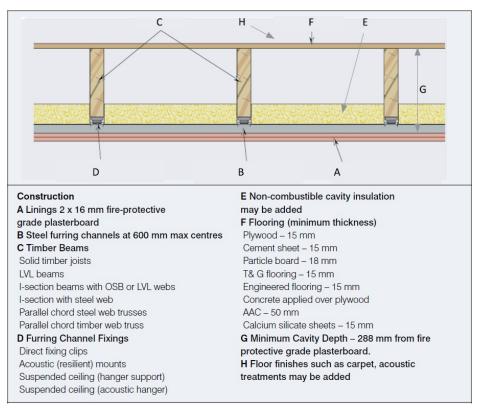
Typical fire-resistant floor system with ceiling supported by steel furring channels.
